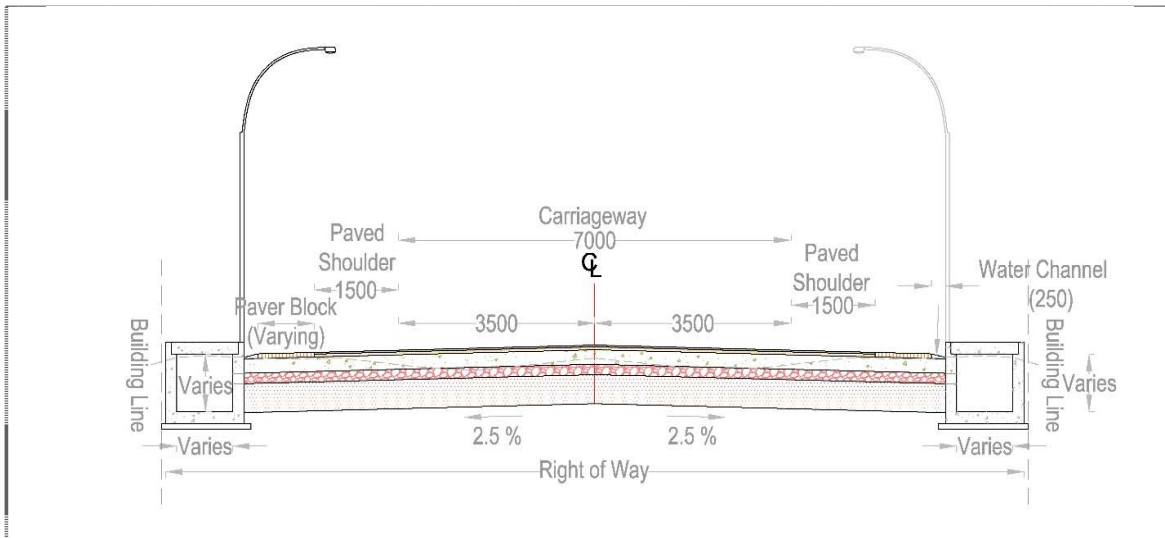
TCS for Project Road Section through Town on Ridge (TCS V)
